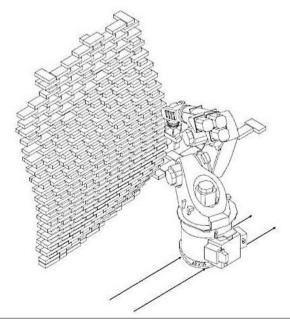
290 Mulberry building the prefabricated brick panels were used
